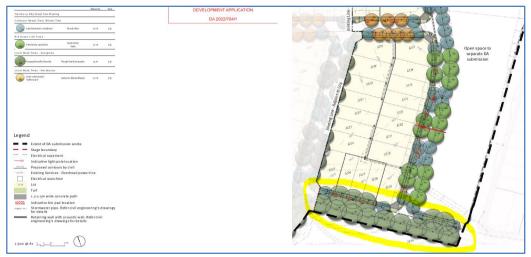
Approved landscaping plan under DA/2022/704/1. Road 421 is outlined in yellow.
